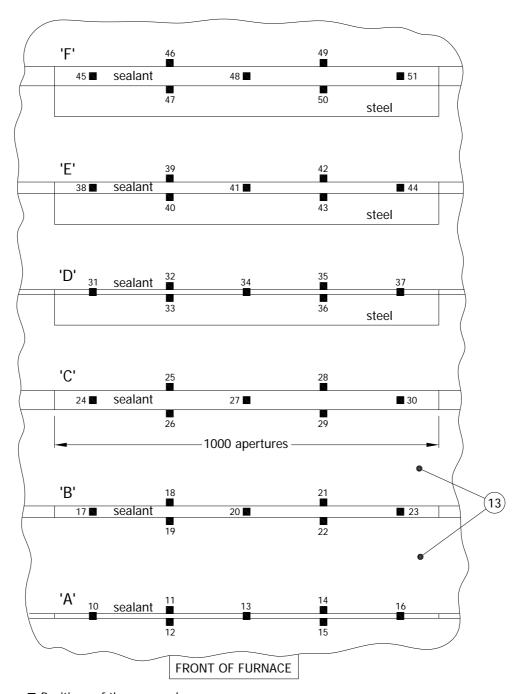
Enlarged View showing Unexposed Face Thermocouples for Floor Test Specimens
